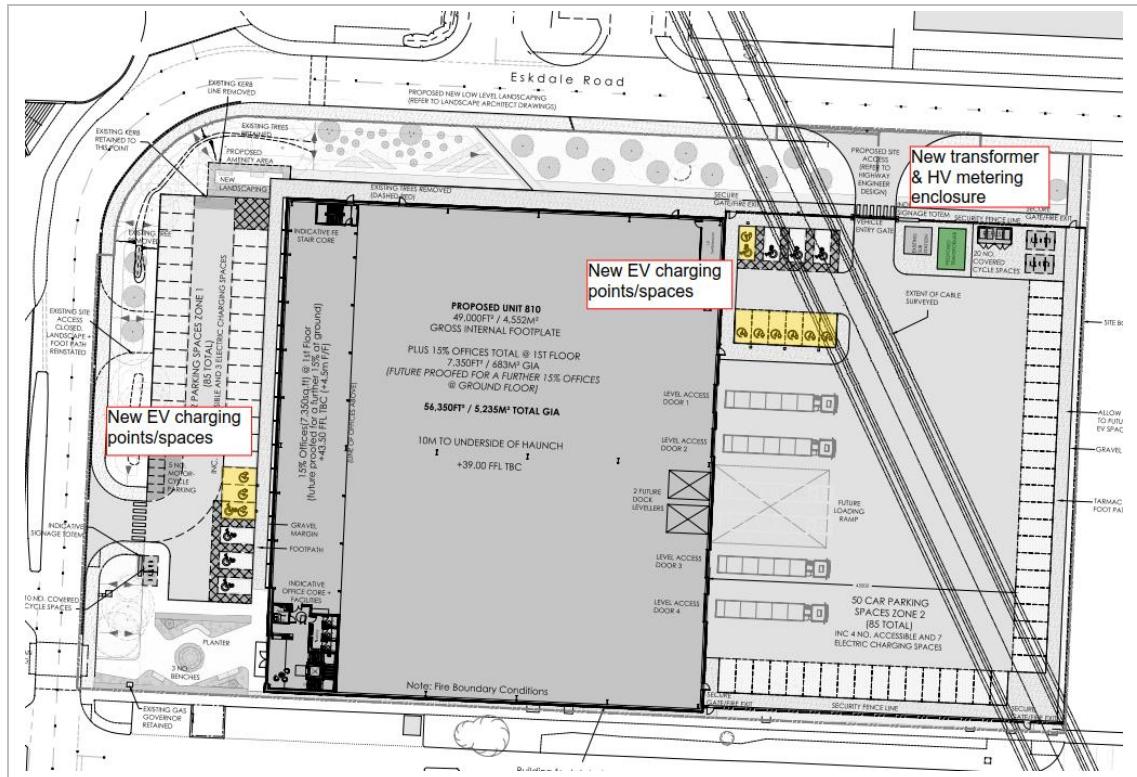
Building 810 – Proposed general layout (Plot 810 Redevelopment scheme)
